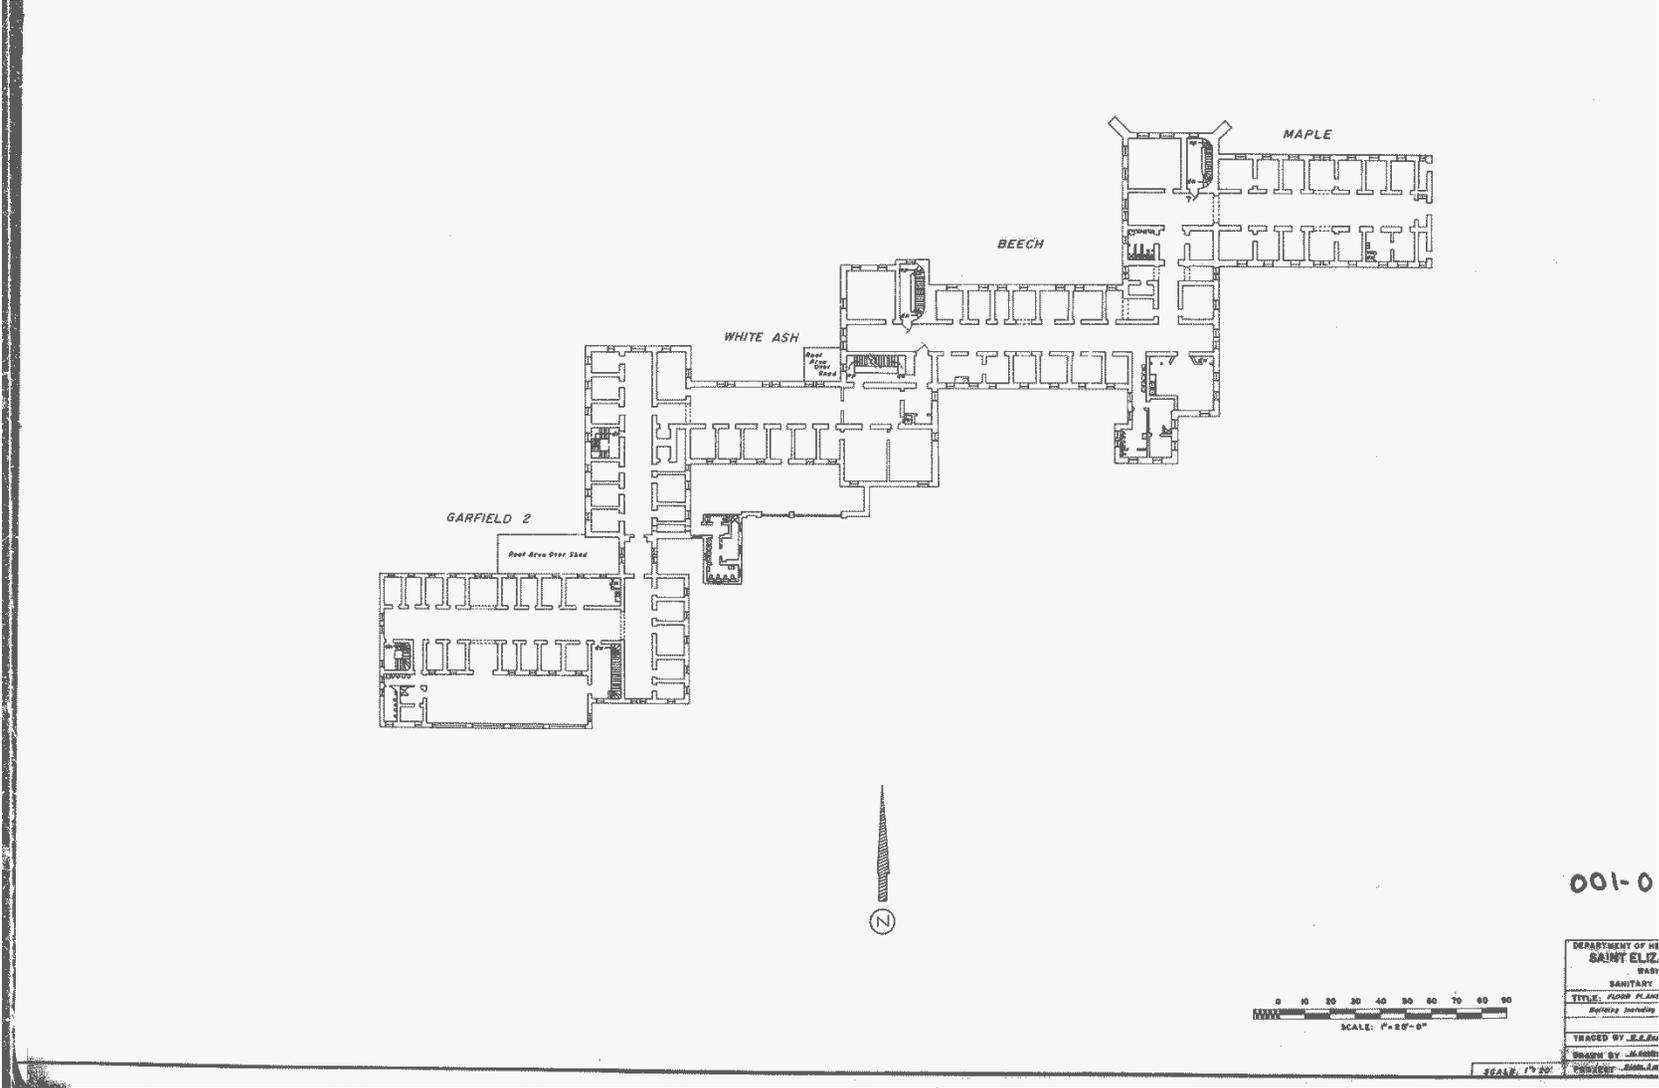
Second floor plan of West Wing and Garfield Building, 1966. Source GSA archives, image DC0070SE0103.
